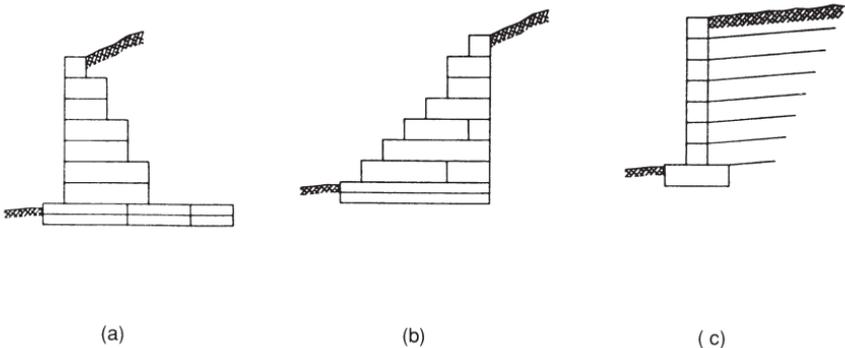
Typical cross sections for a) gravity gabion wall (stepped); b) semi-gravity gabion wall; and c) reinforced soil gabion wall.
